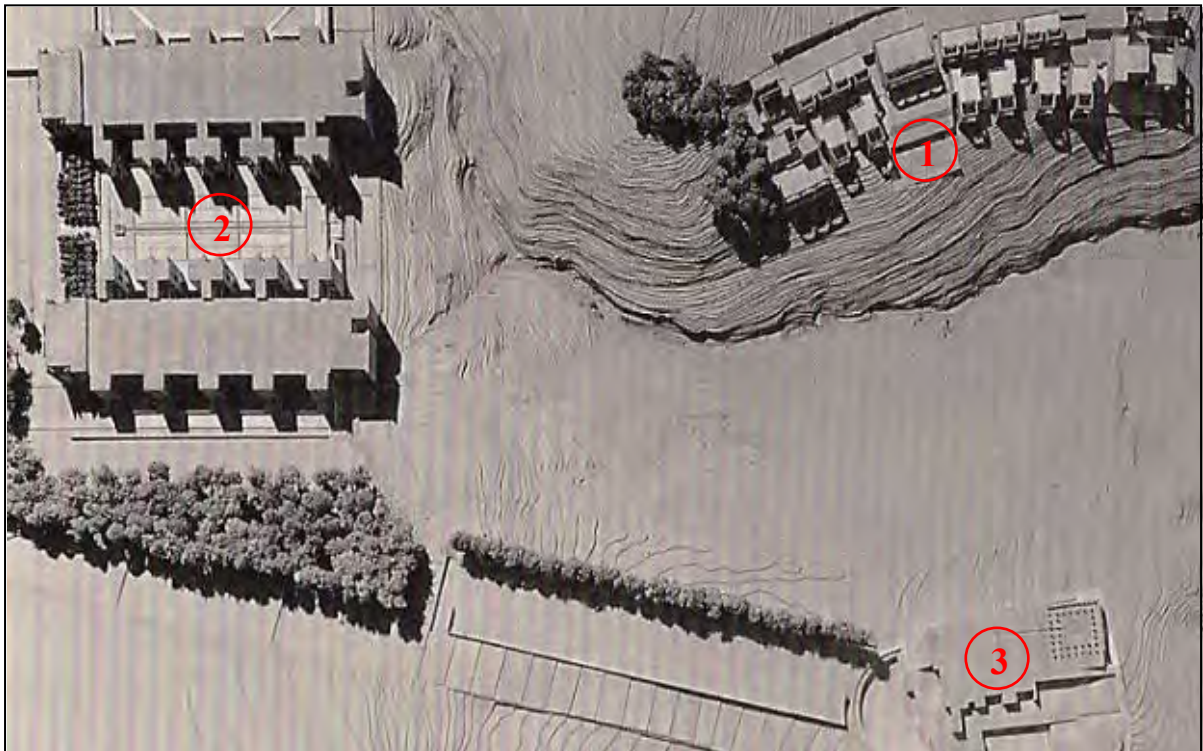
(Source: Stoller, 1999) : Site plan of the model (NTS).
